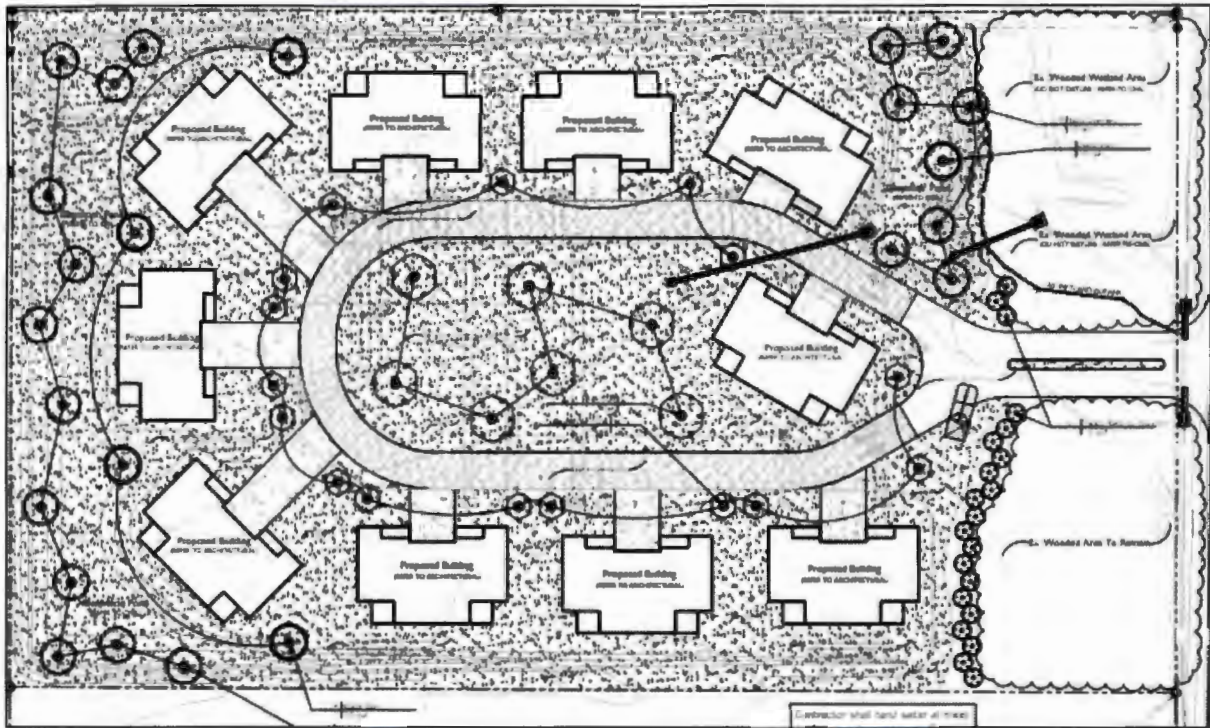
Tin Tops @ Gayfer SD.19.40 previously submitted Landscape Plan.
